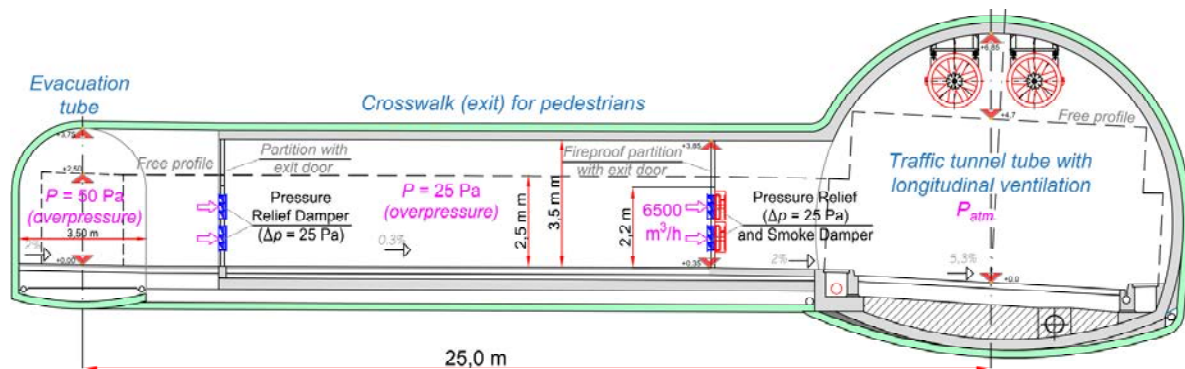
Cross-section of the traffic tunnel tube and the evacuation tunnel for pedestrians
